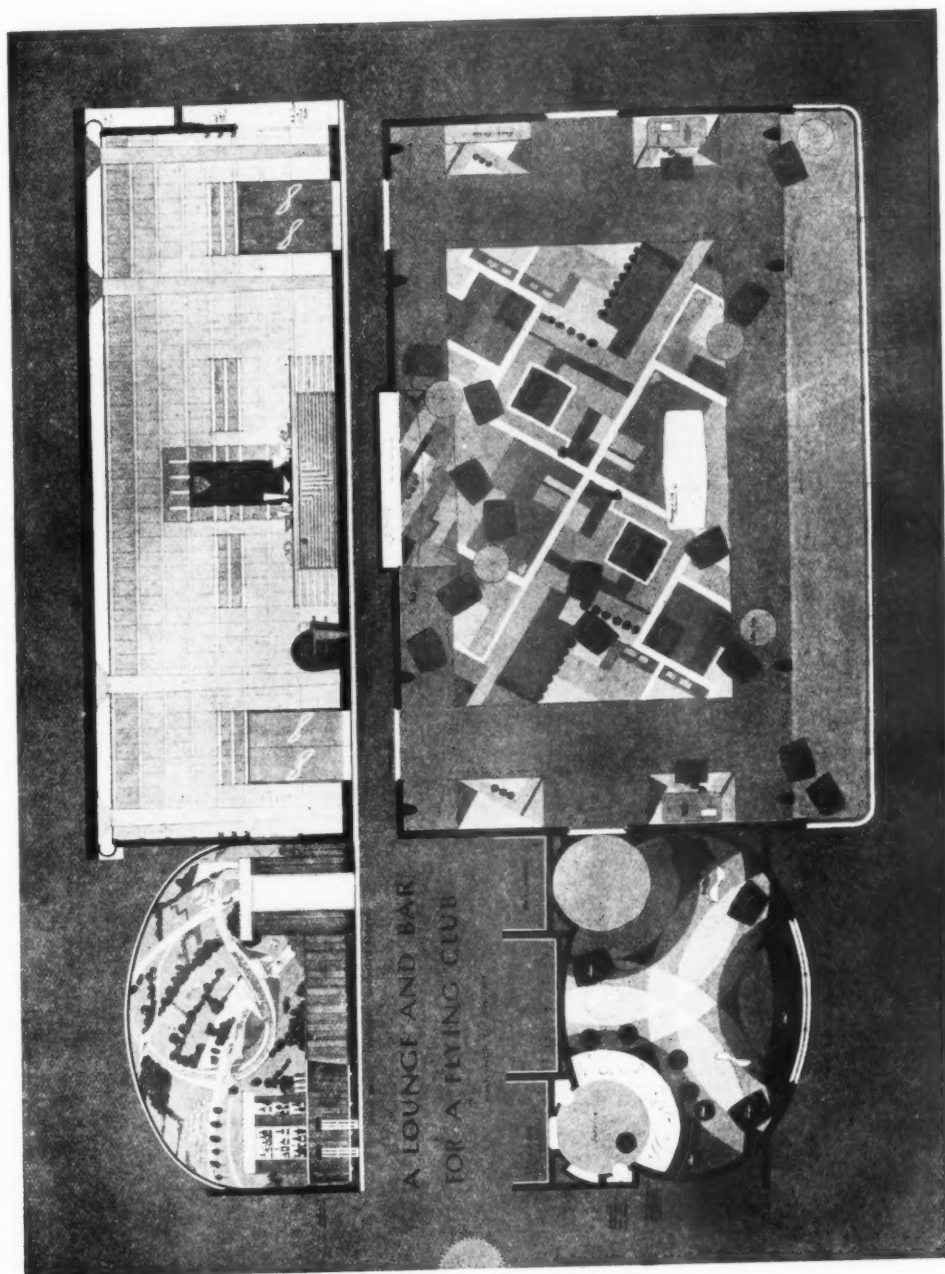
FLOOR PLAN AND SECTION LOOKING NORTH OF A COCKTAIL BAR FOR A FLYING CLUB.
